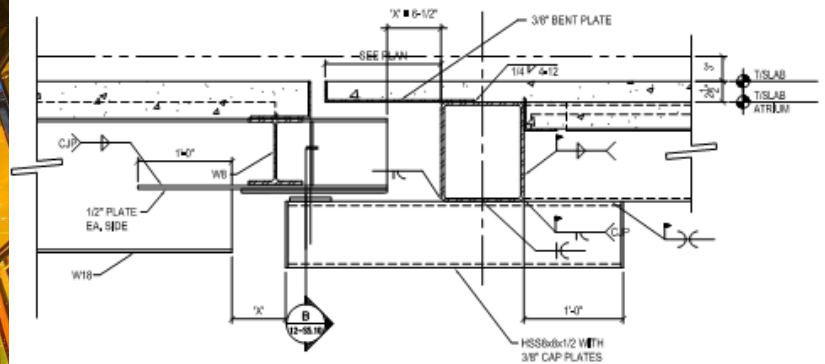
Connection details for the bridges at levels 3, 7, and 11.
